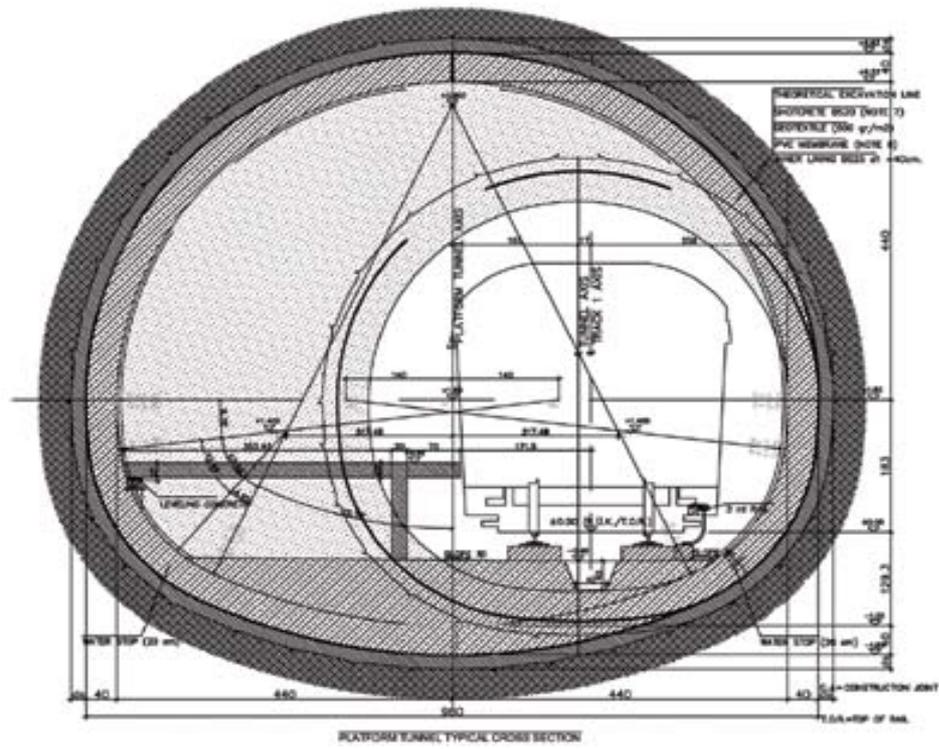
Platform tunnel cross-section (Türkerler-Limak, 2004)
